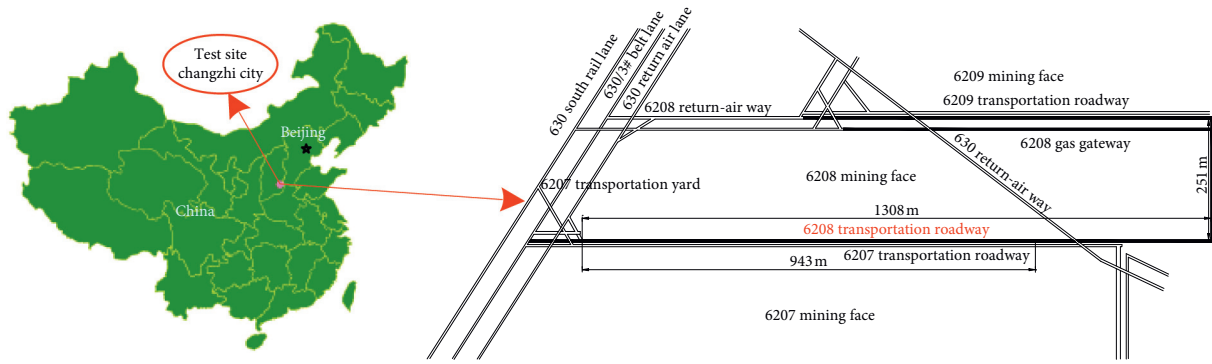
Schematic diagram of 6208 roadway engineering plane in Wangzhuang coal mine.
